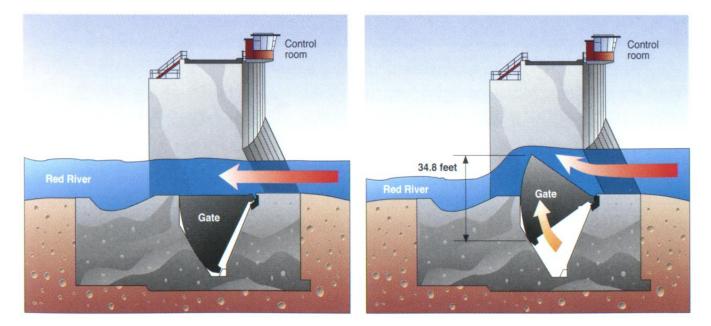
CROSS SECTION OF FLOODWAY INLET CONTROL STRUCTURE – SHOWS OPERATION OF GATES
